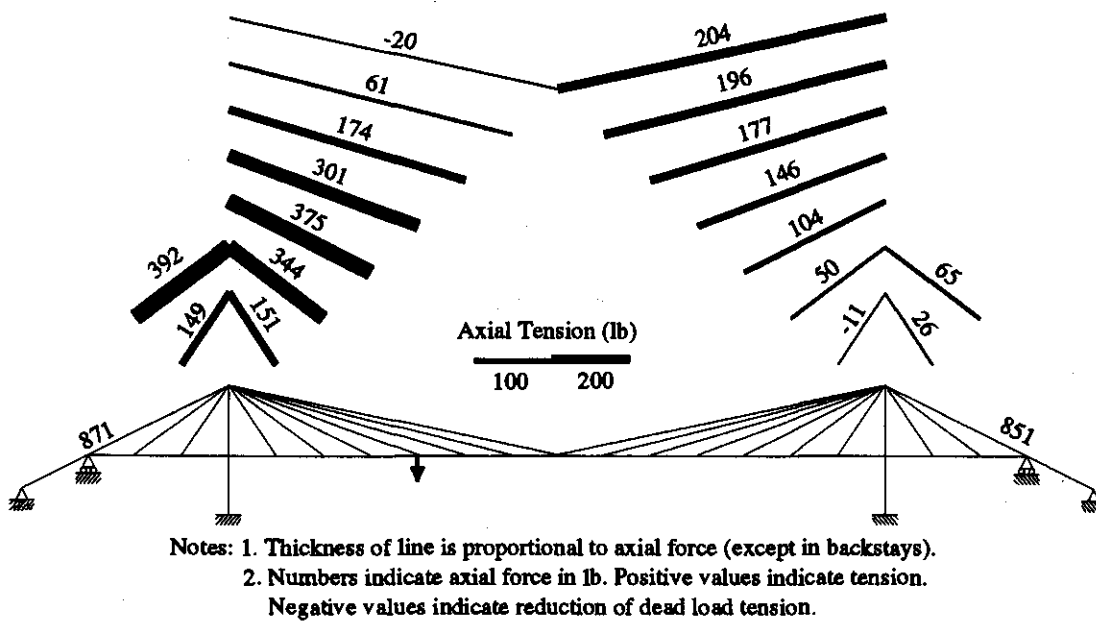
Live Load Forces and Deflections in Truss of Bluff Dale-Type Bridge with Modern Fan Cable Pattern
